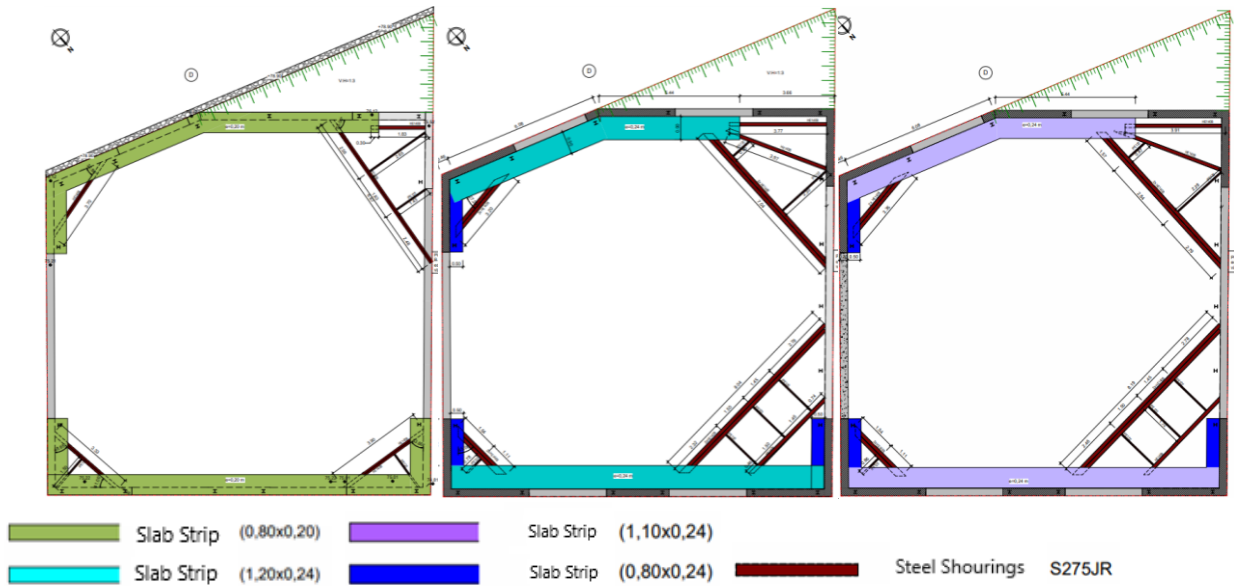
Design plan view of the peripheral earth retaining solution at levels 0, -1 and -2
